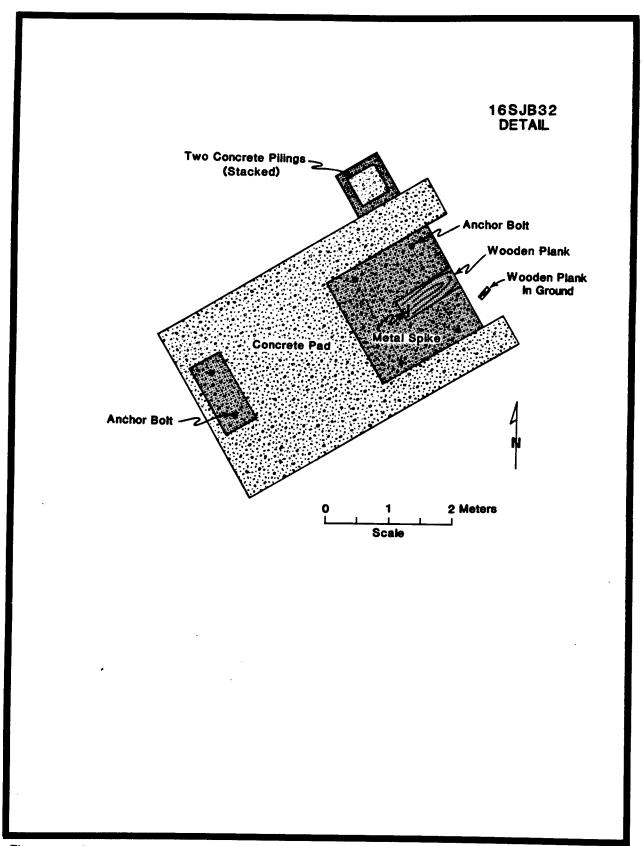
Detail plan of the concrete pad at site 16SJB32.
